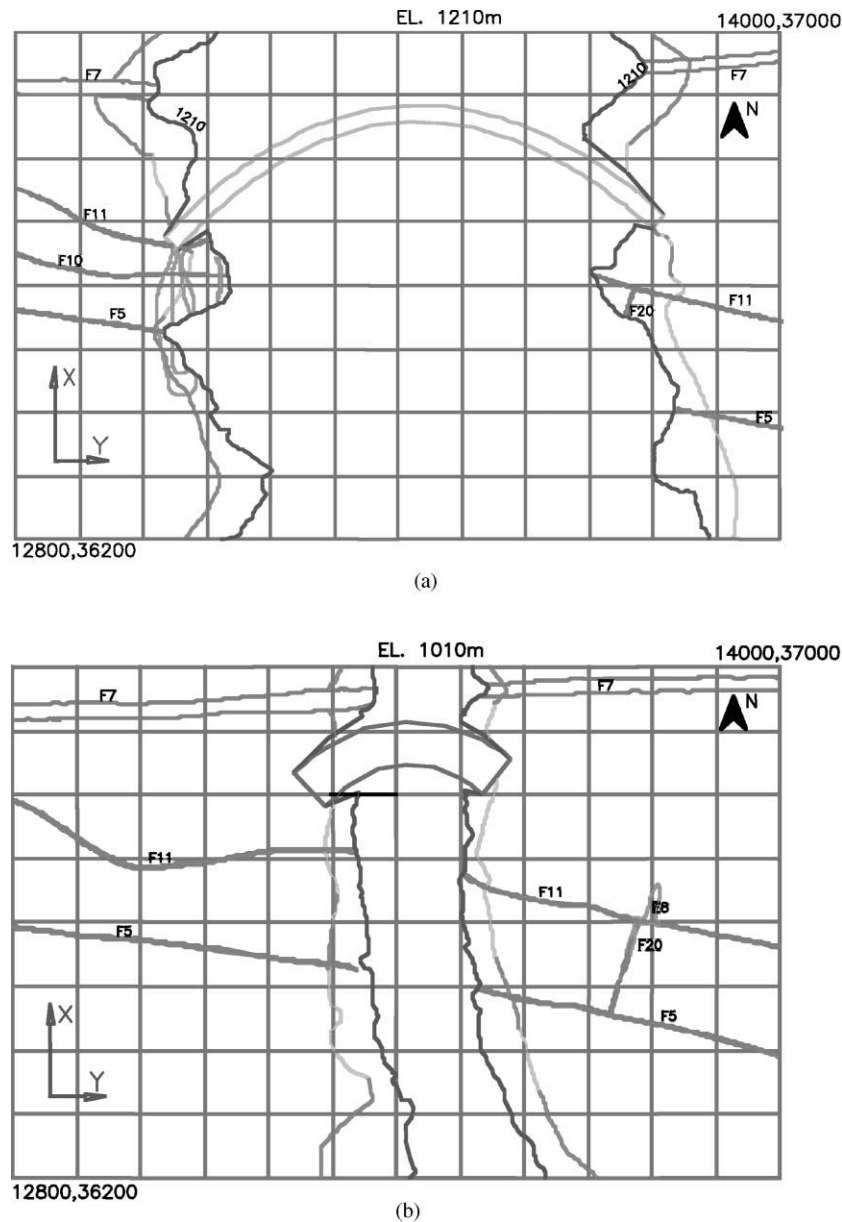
Typical horizontal cross-sections of the Xiaowan arch dam at: (a) elevation 1210m and (b) elevation 1010m.
